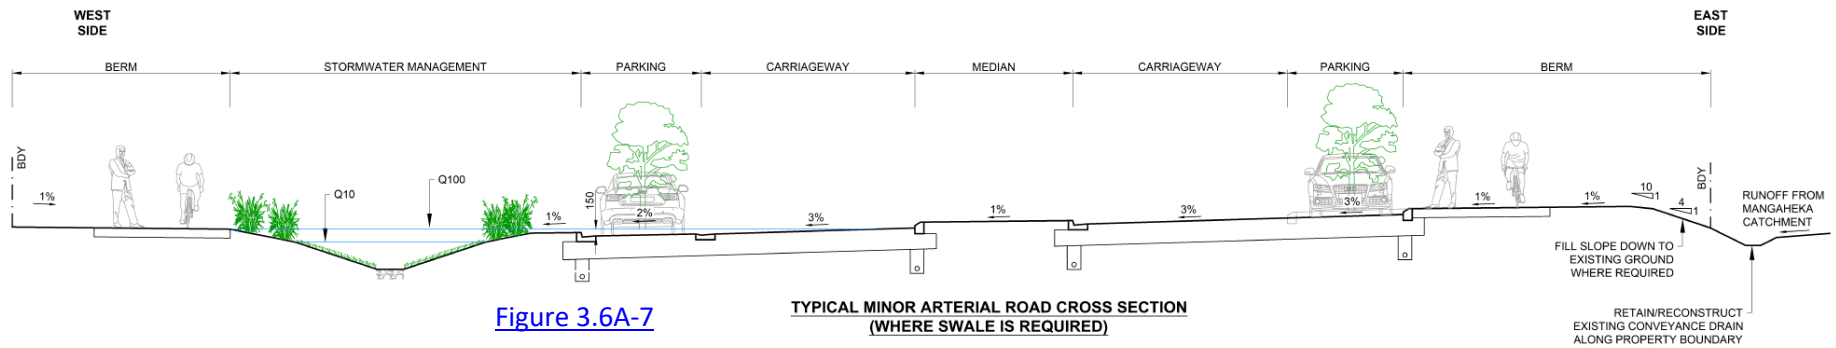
A-7 TYPICAL MINOR ARTERIAL ROAD CROSS SECTION (WHERE SWALE IS REQUIRED)
